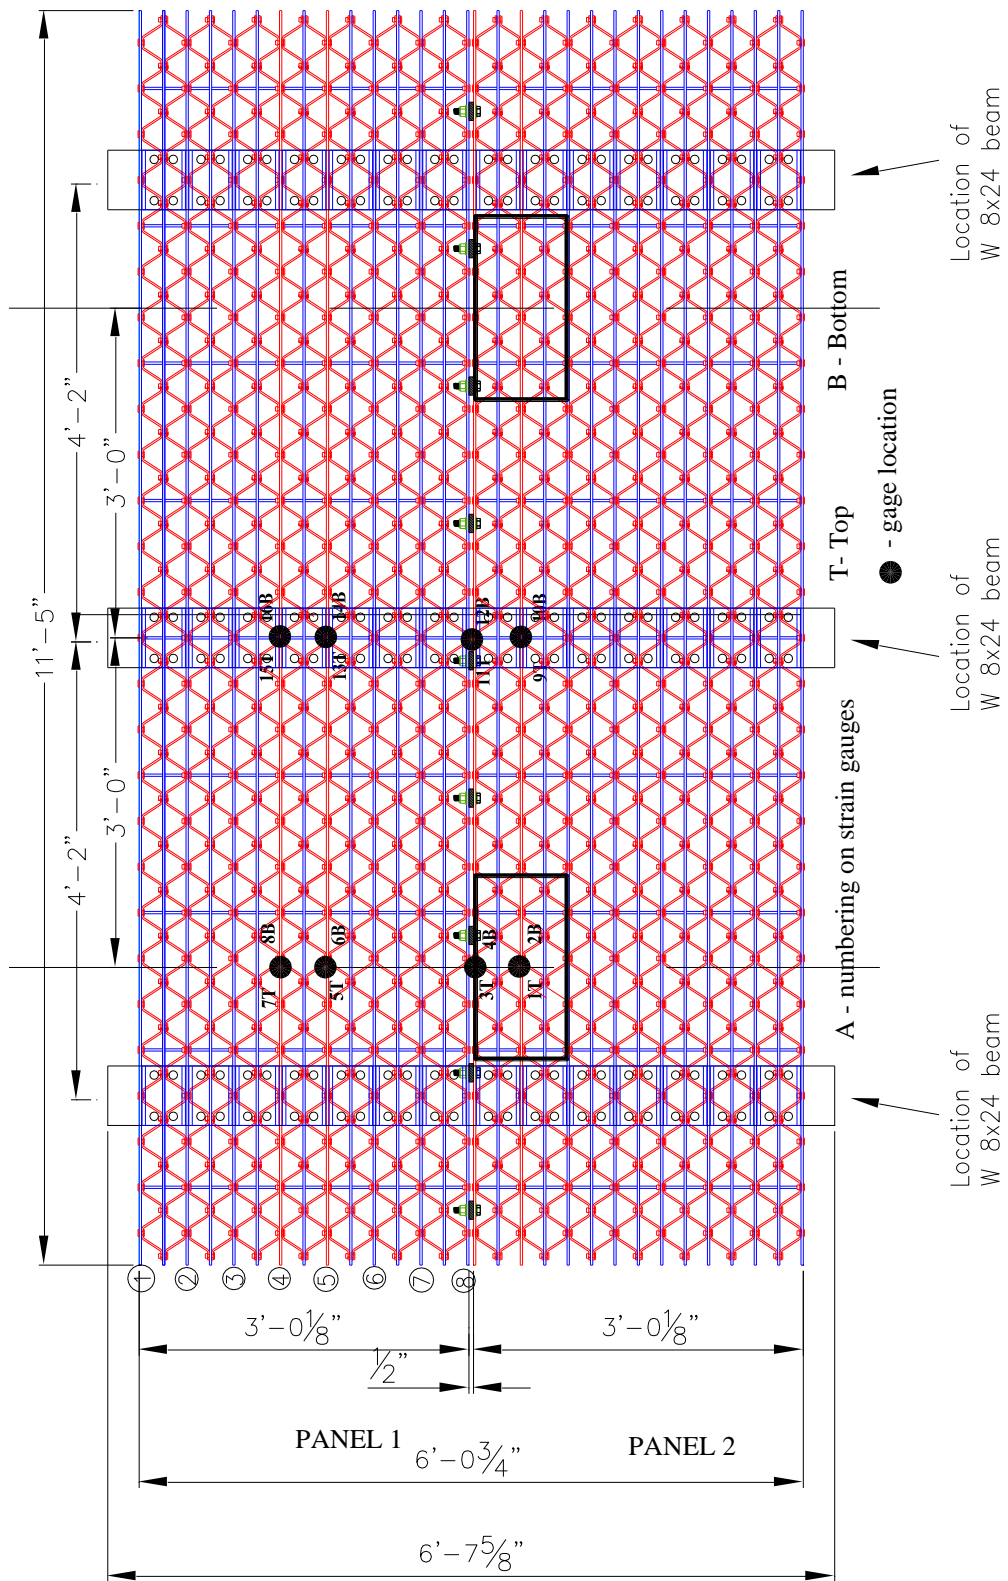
General Arrangement of 37R5-A2 with gage and load positions for test #2 and #4
